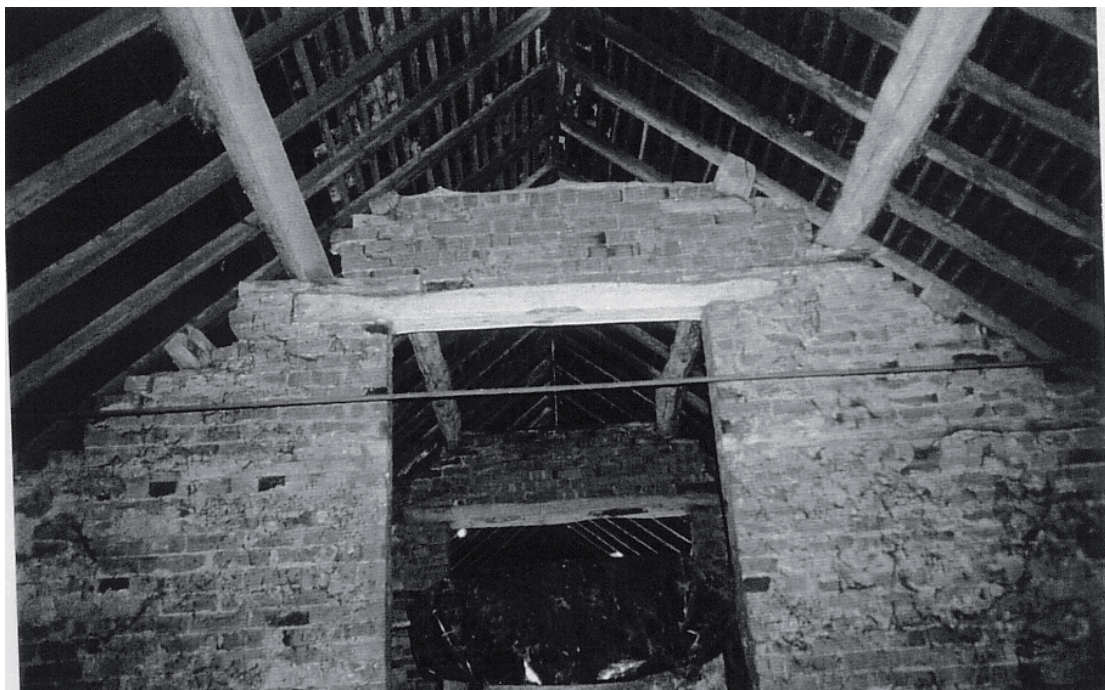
Interior Detail-West Range- Barn, showing brick walls as supports for purlins and some re-used fabric serving as purlins on the inner bay.
